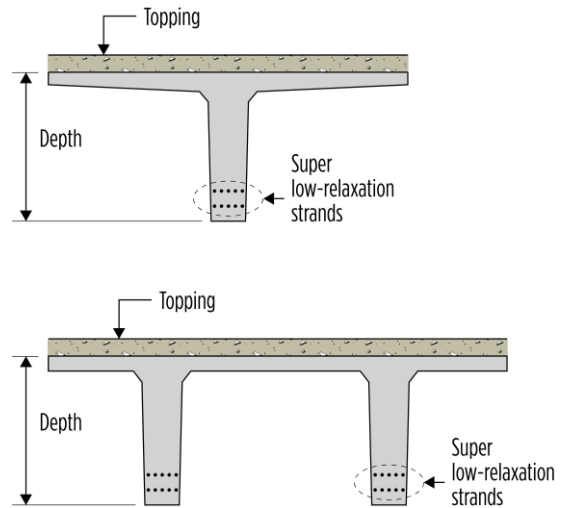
Single and Double Tee Beams with Cast In-situ Concrete Topping
